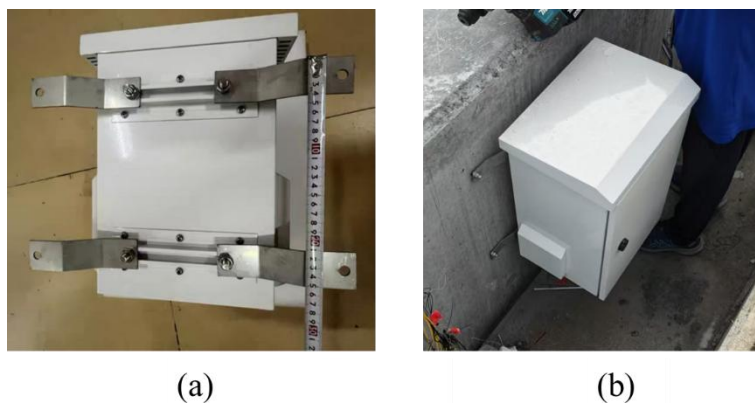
(a) Back of outdoor waterproof metal box (b) Installed outdoor waterproof metal box
